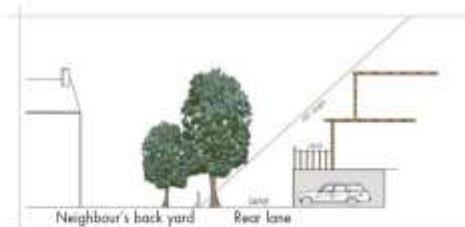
Building within angular planes from this rear lane protects existing neighbour's back yard privacy and access to sunlight.
